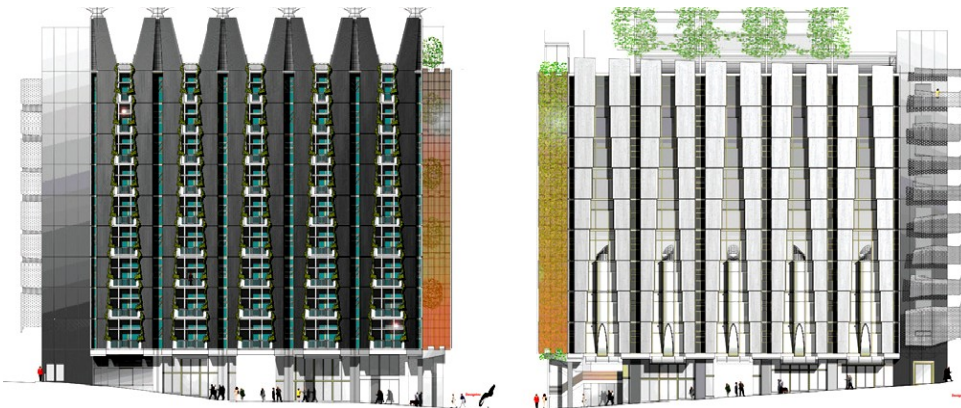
Solar stack ventilation ducts on north façade (right) and south facades (left)²³
